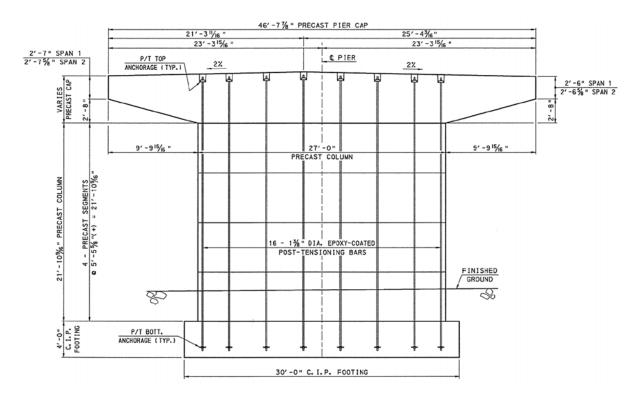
Pier 1 Elevation (Pier 2 similar) *Note: Intermediate anchorage and couplers not shown.
